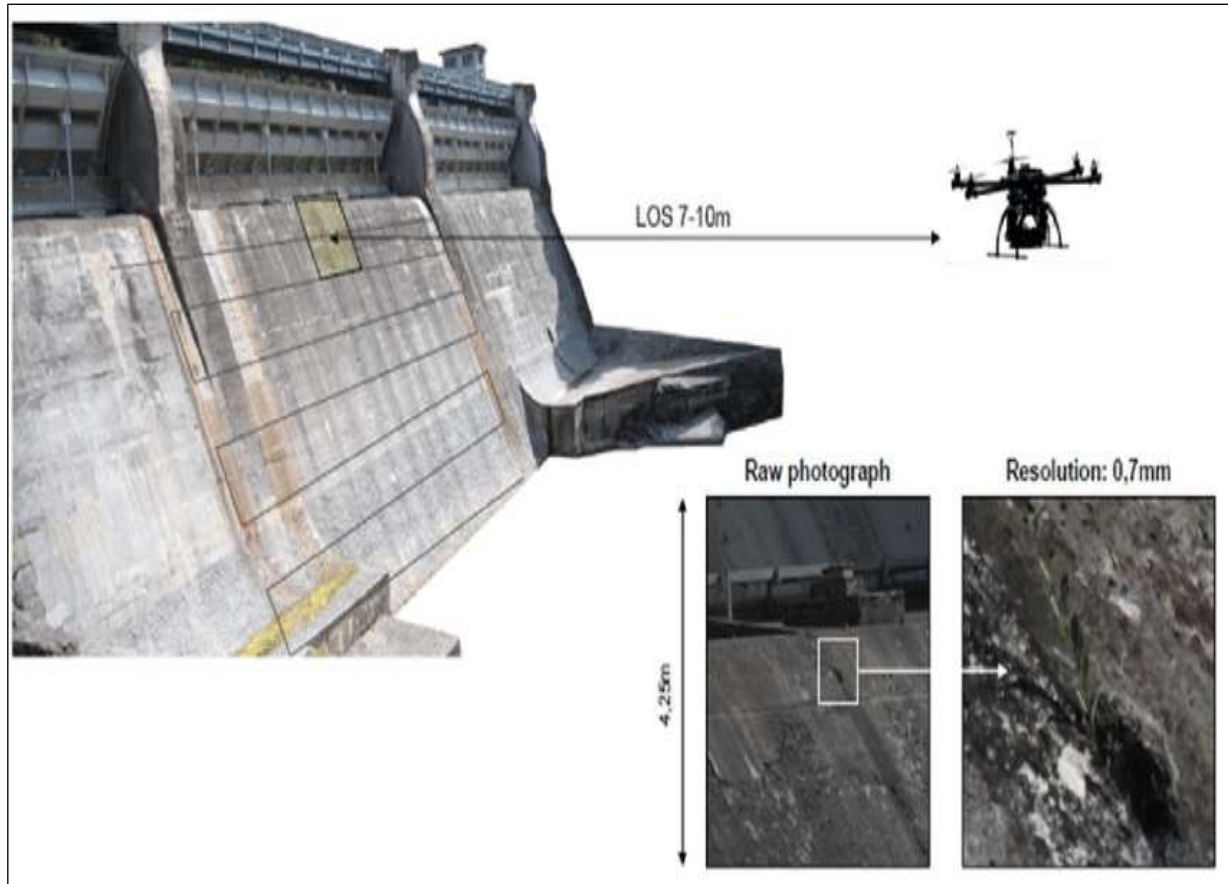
AI Powered DoT for concrete crack detection system.
